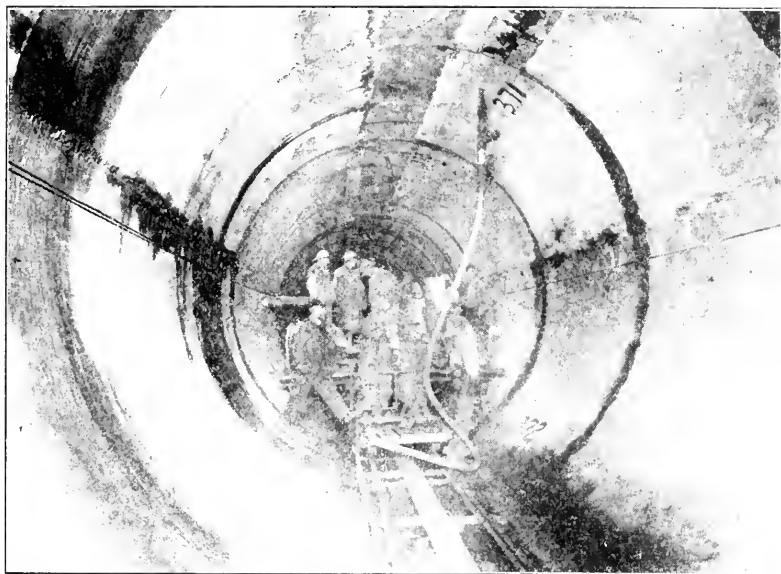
GROUTING EQUIPMENT IN OPERATION IN CITY TUNNEL.
